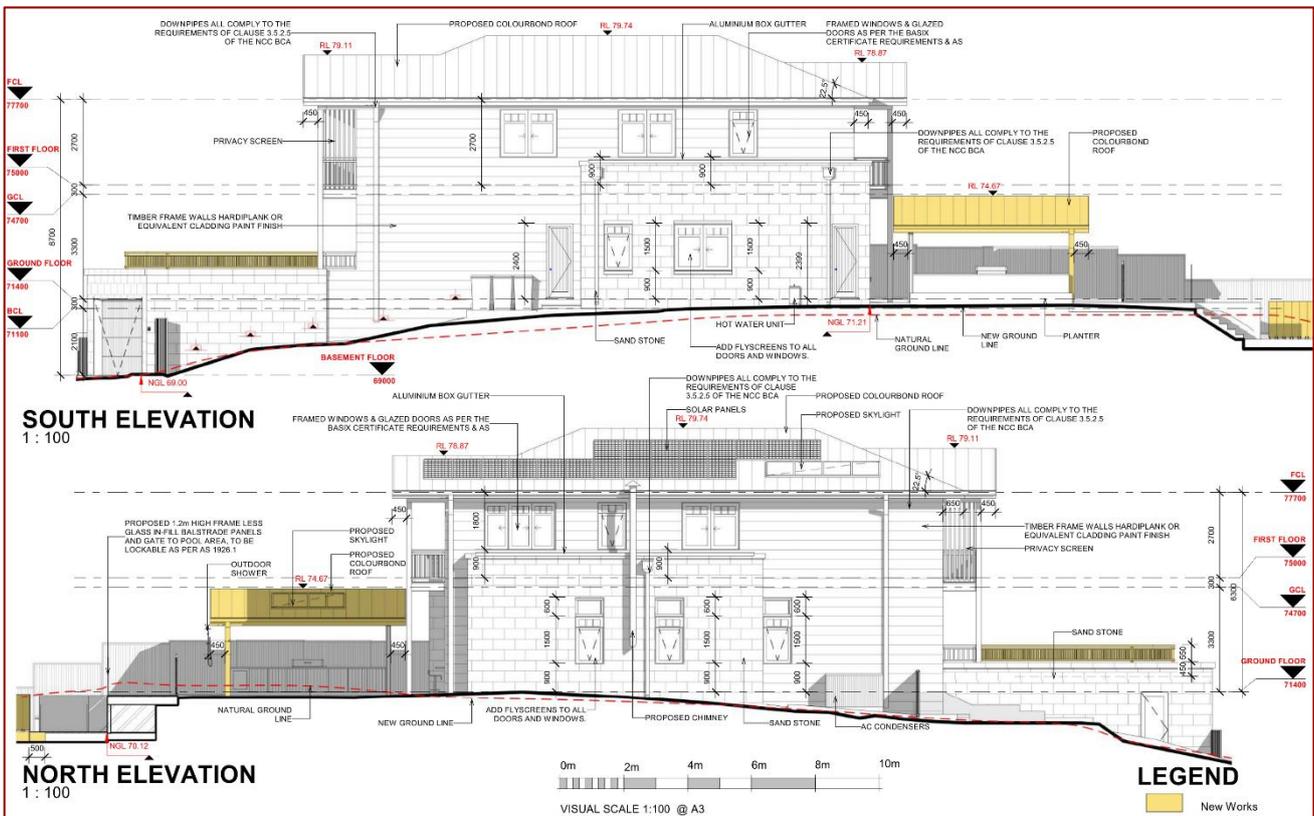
BASIX sample Detached dwelling North & South Elevation
